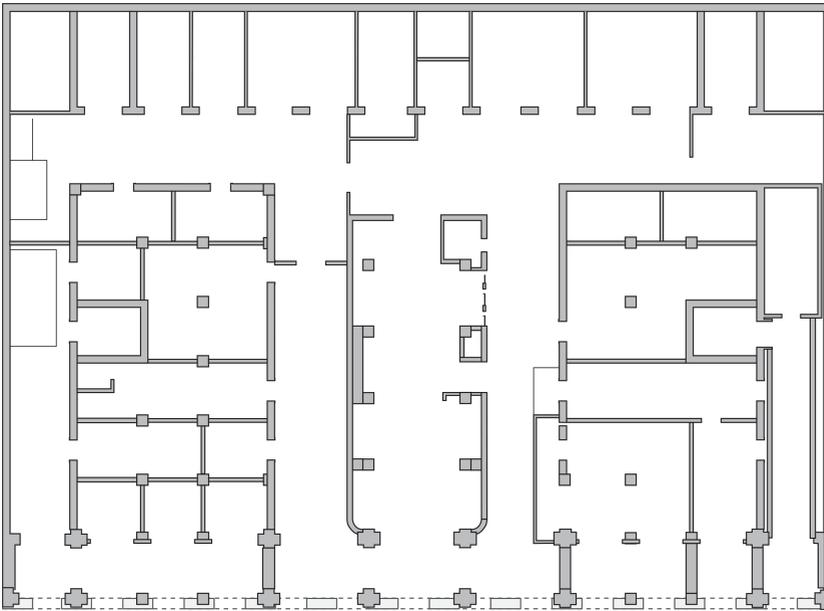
Current ground floor plan of Bazar Abbas.
